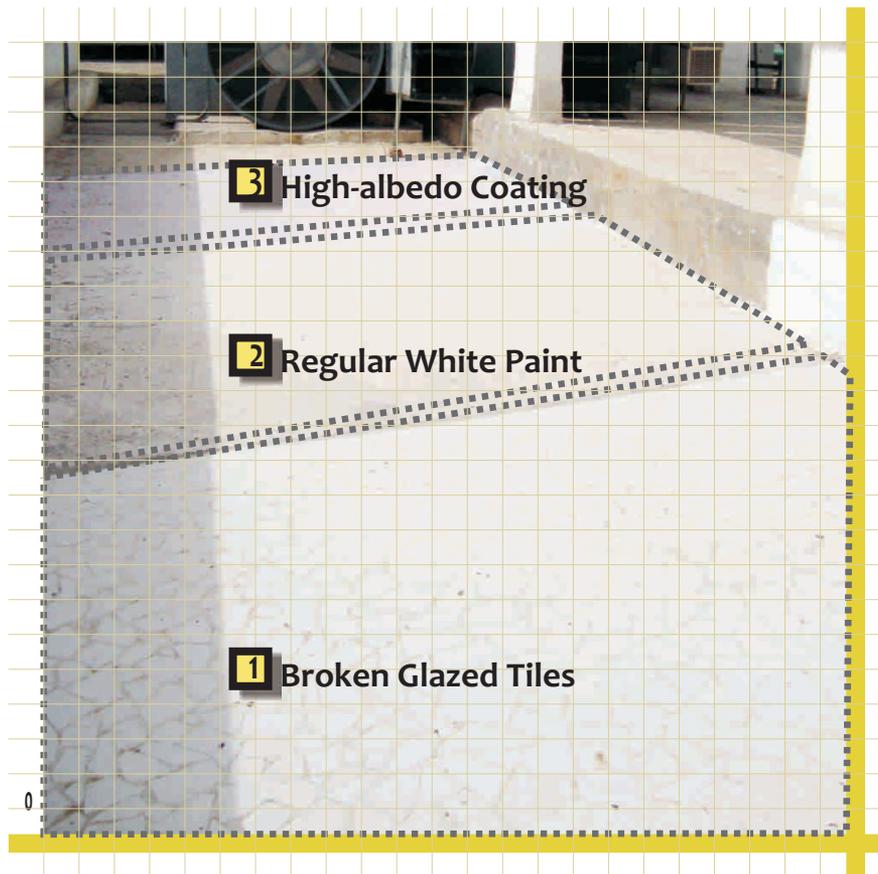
Photograph showing the layout of various cool roofing options as patches on a concrete roof surface in an office building in Delhi.
